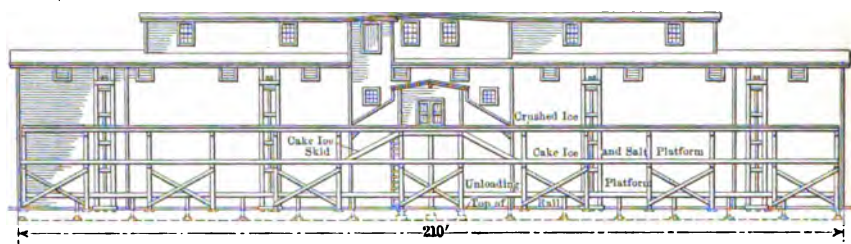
Front elevation, icing plant, Hawthorne—Chicago, Burlington & Quincy.
